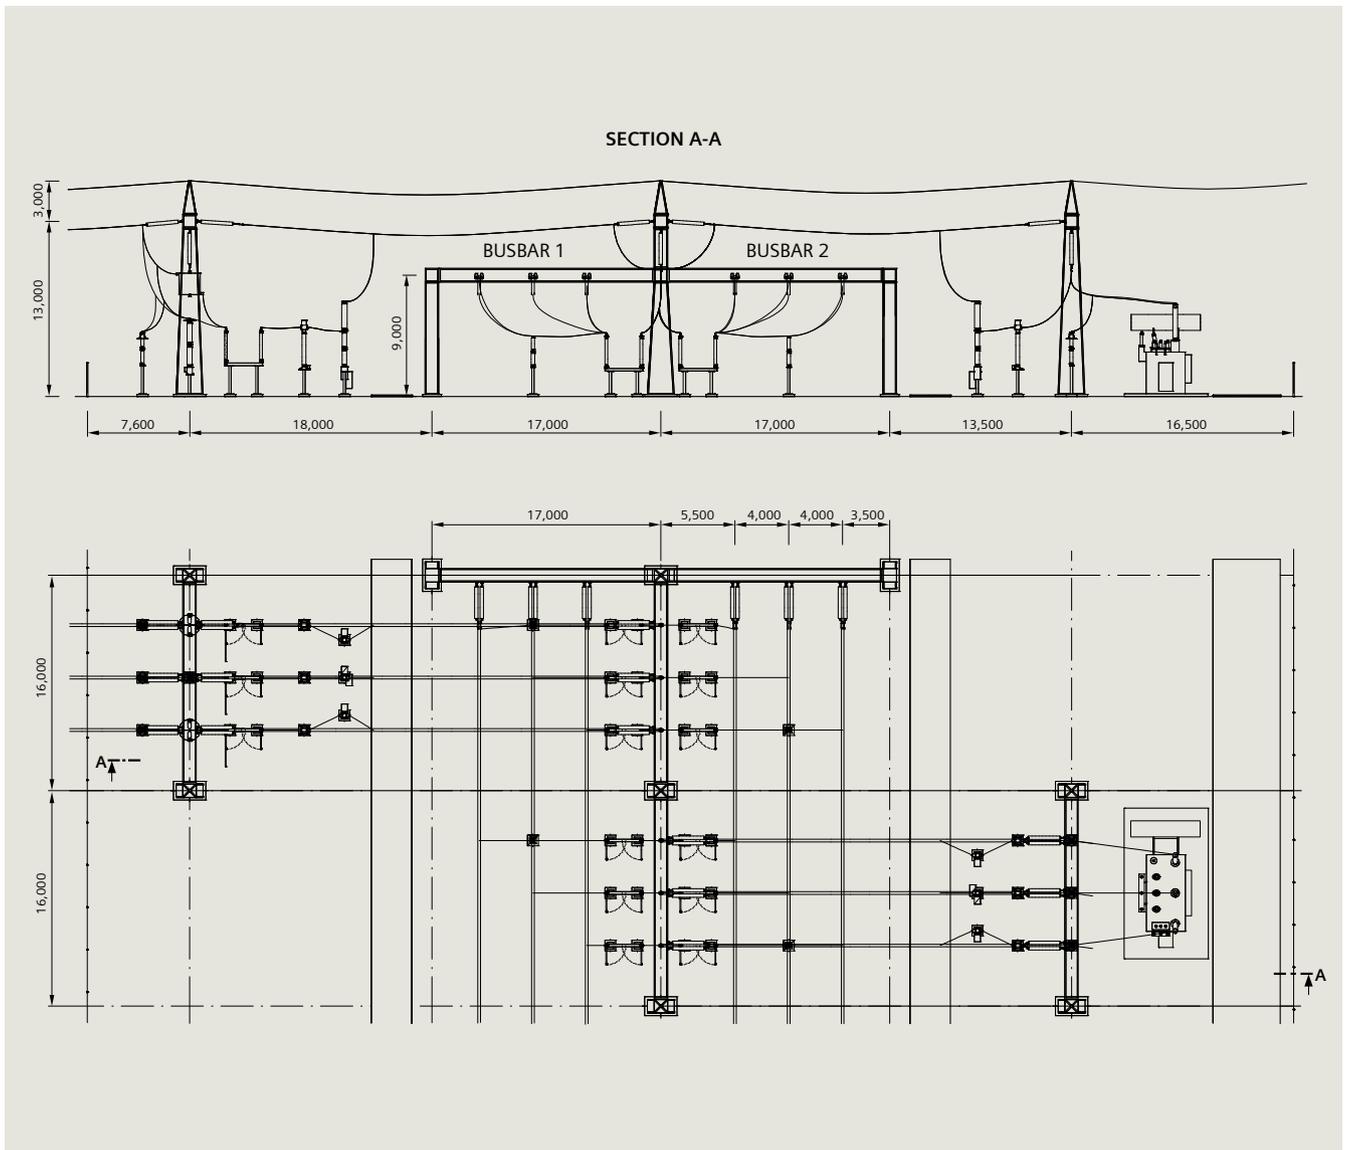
Central/center tower arrangement, 220 kV
